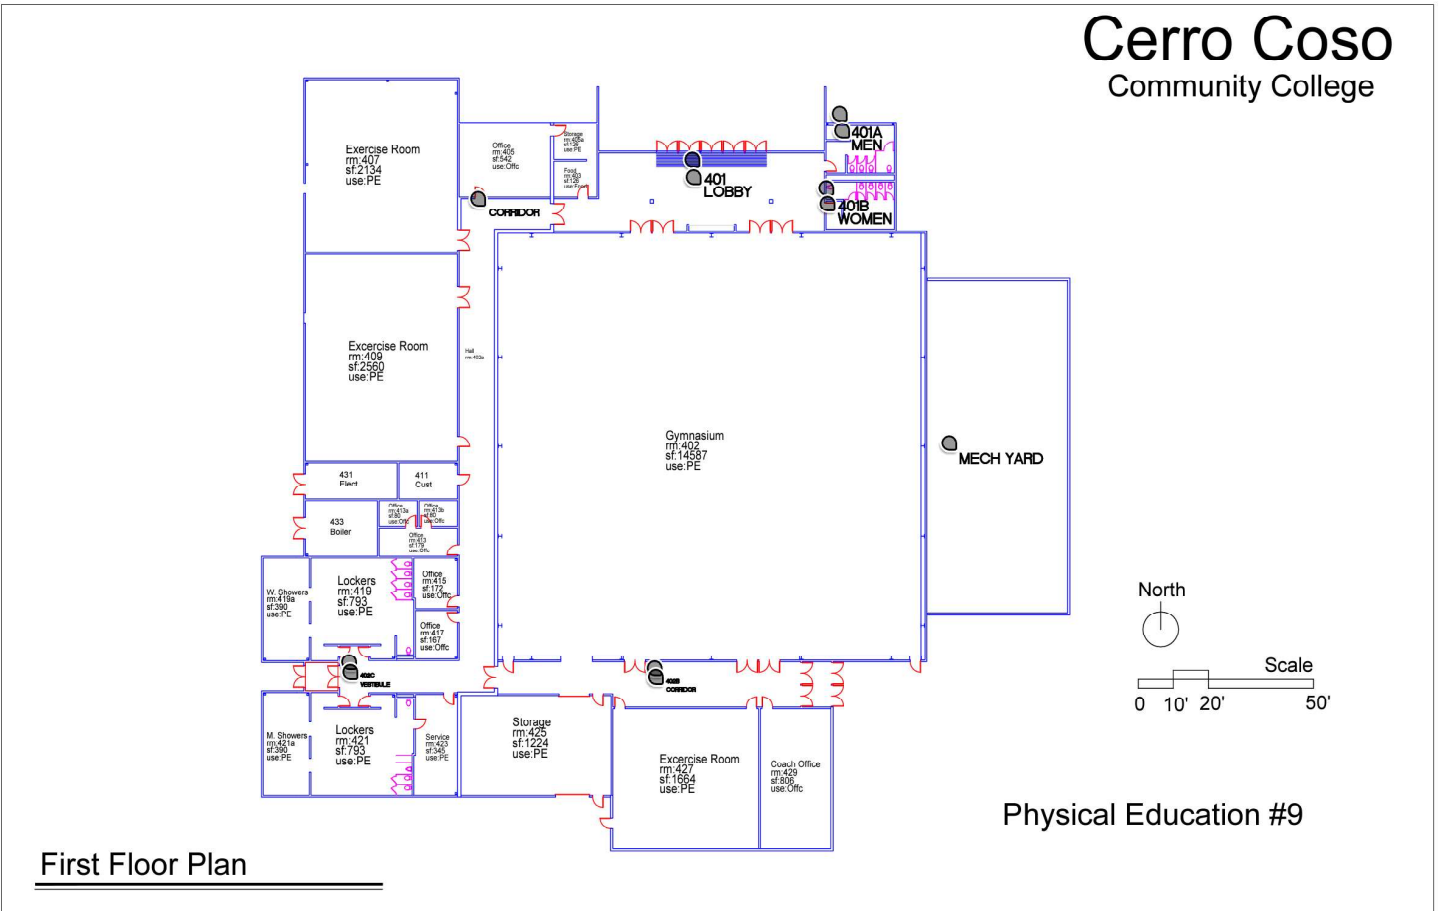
IWV / Ridgecrest Gymnasium Utilization and Floor Plan
